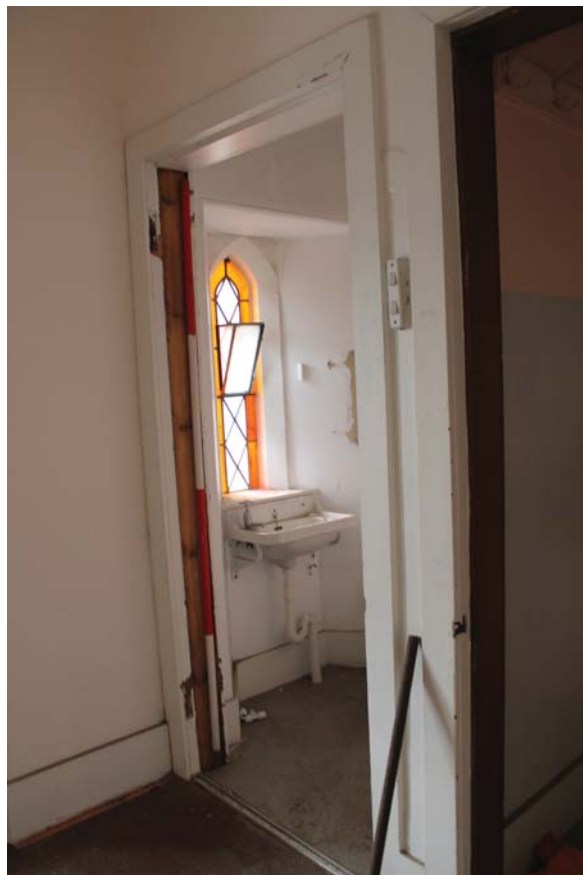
Room 0/4, detail of small window in the south-east wall from the north
